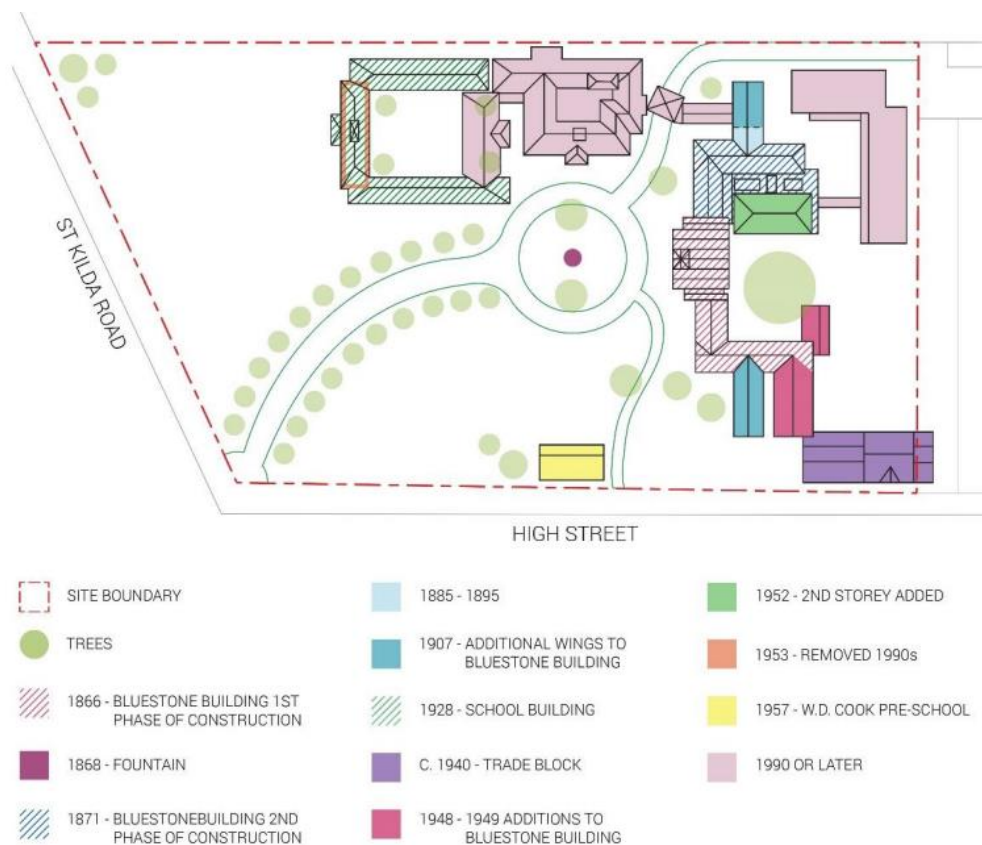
Diagram showing the historical development of the site since the construction of the first building, the bluestone building, in 1866. Source: NBRS, 2022.
